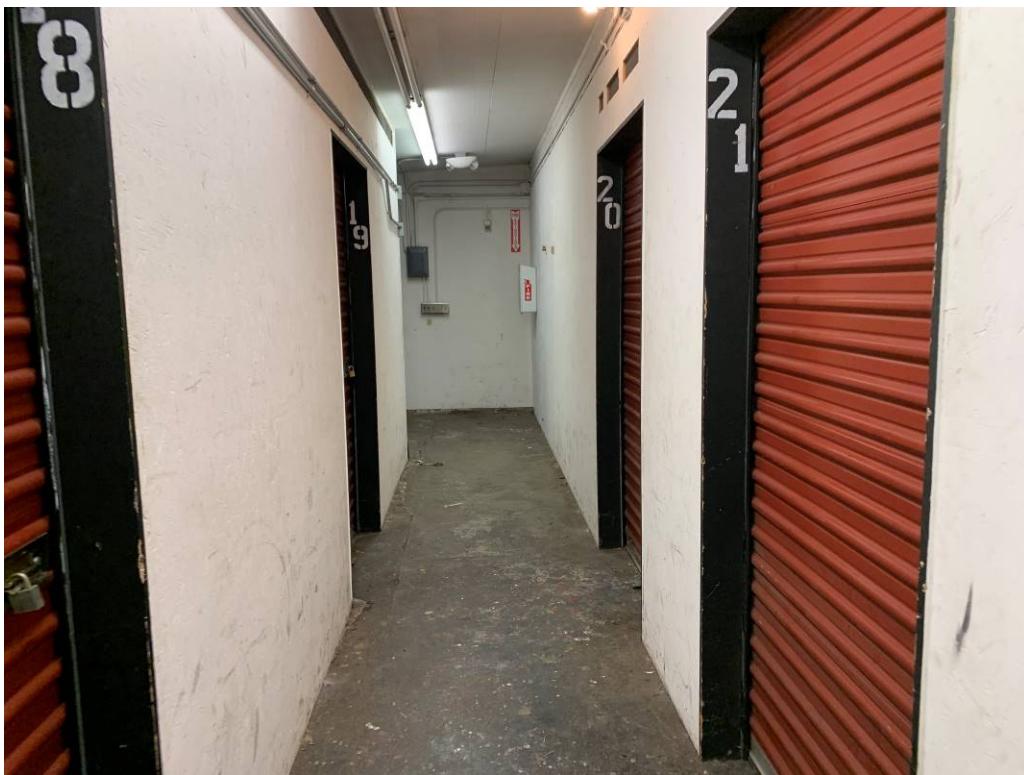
Typical finishes observed in the storage units. The floor tile and mastic are less than 1% asbestos.
